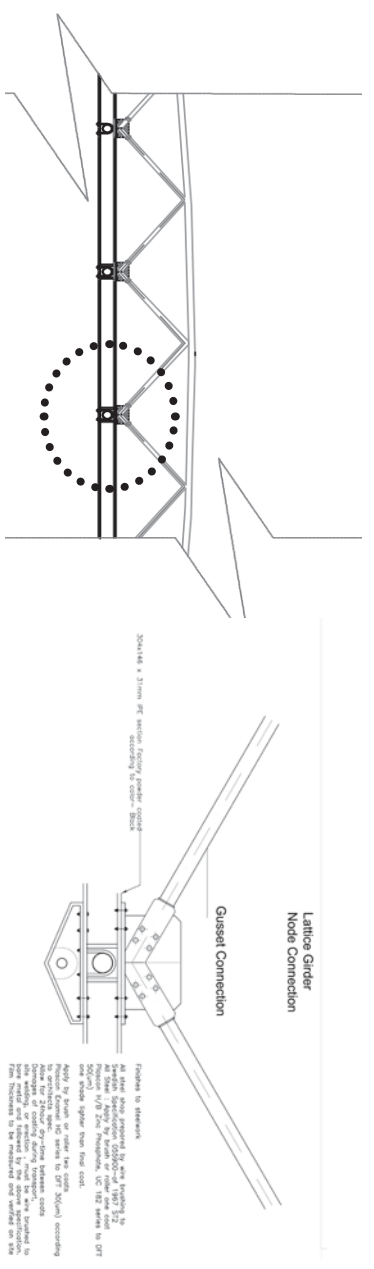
Technical detail section of truss and pin connection (see also Fig. 8.21.12 A)
